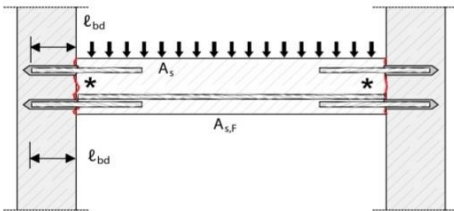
Anchoring of reinforcement to cover the line of acting tensile force.
